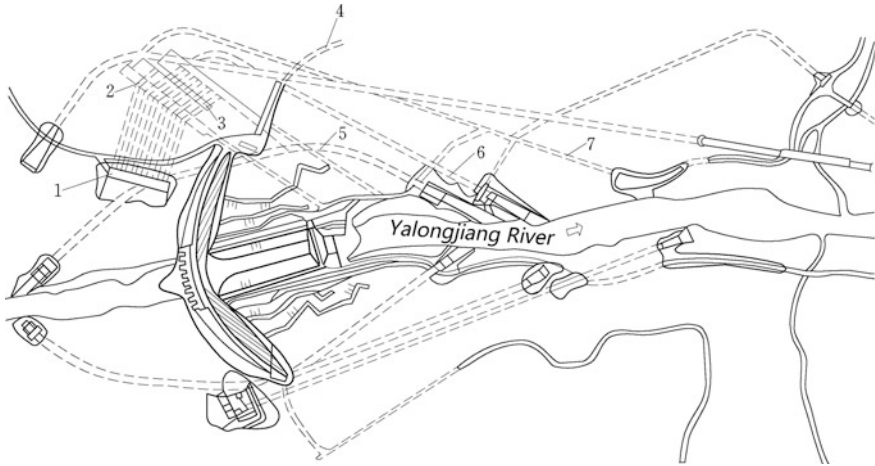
Ertan Hydropower Project (arch dam)—China 1 Power intake, 2 Main machine house, 3 Main transformer chamber, 4 Left bank high way, 5 Number 2 tail race tunnel, 6 Number 1 tail race tunnel, 7 Access tunnel for power house
